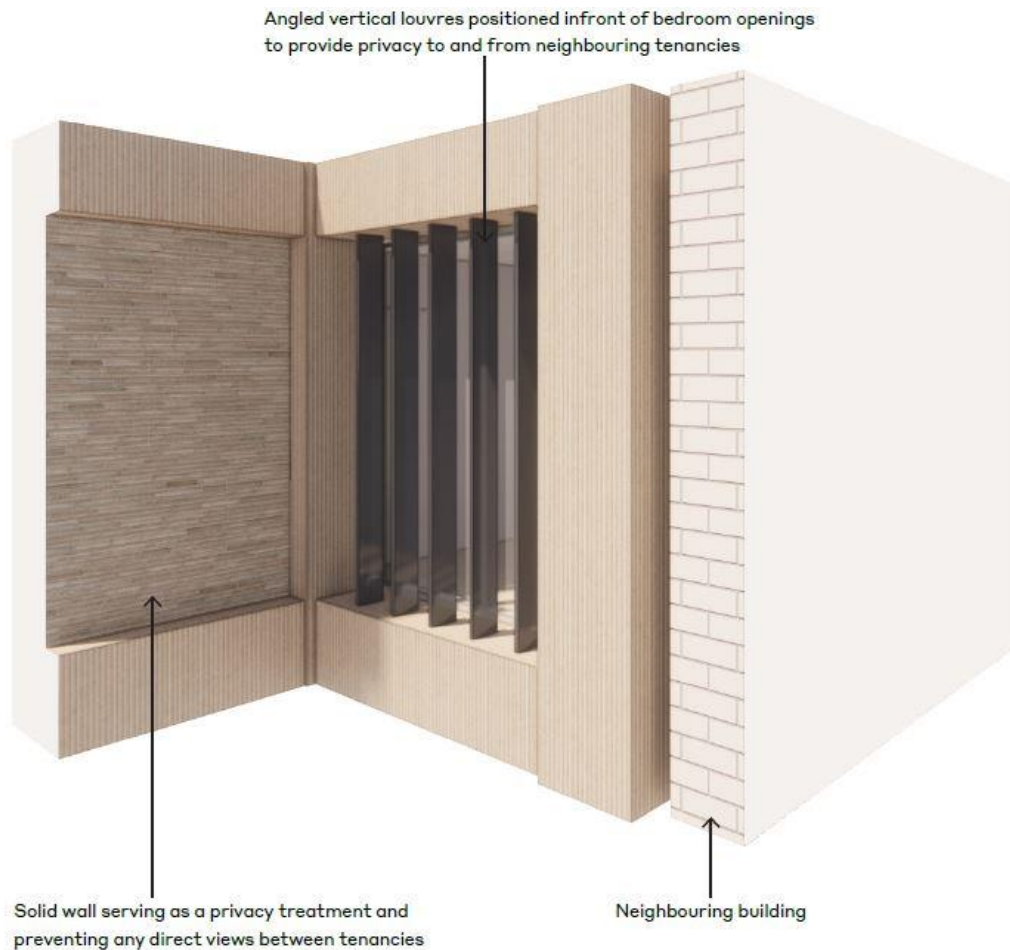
3-dimensional axonometric extract from the architectural design report submitted with the application, depicting the privacy louvres proposed to apartment bedrooms
